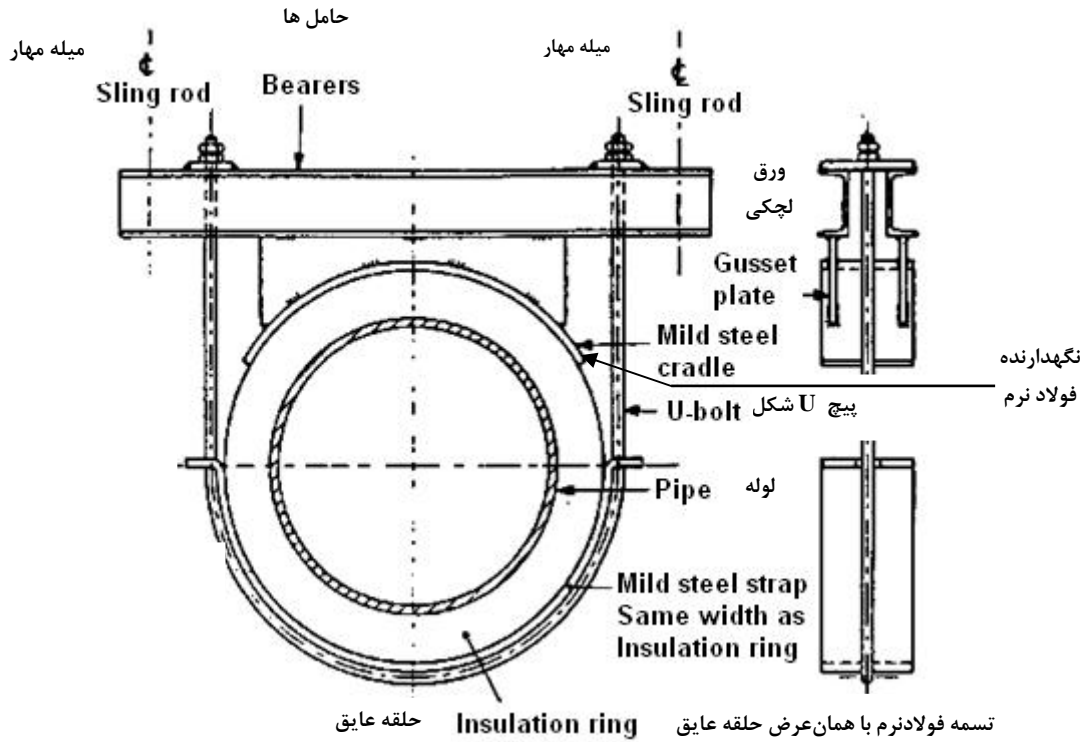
INVERTED U-BOLT CRADLE USING INSULATION RING
